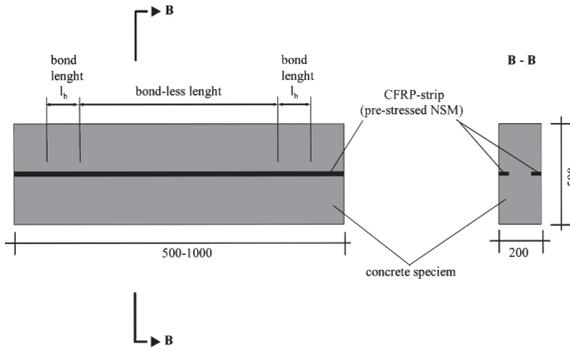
test specimen for analyzing the structural behaviour of prestressed NSM reinforcement
